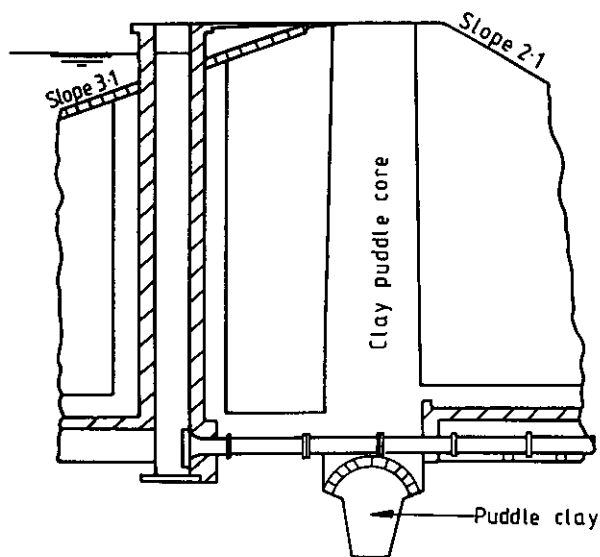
Kentmere Reservoir – Arrangement of valve well core and culvert
